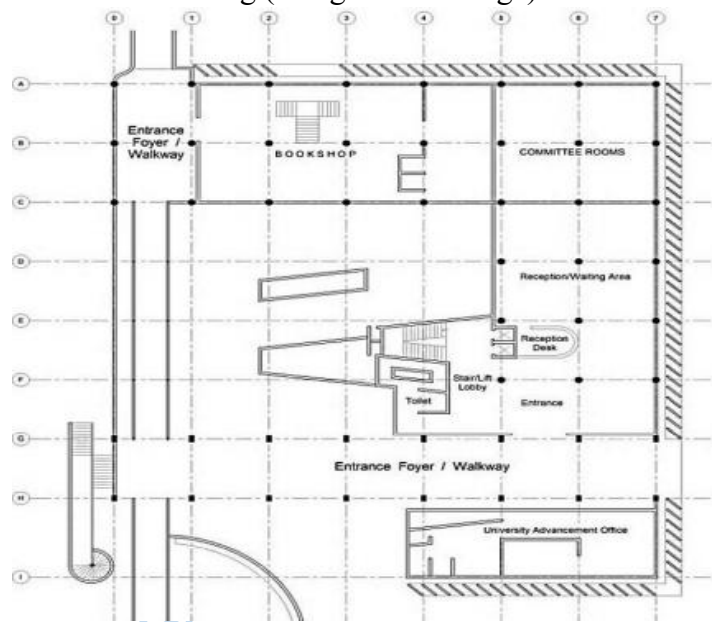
Ground floor plan of OAU Senate Building (Source Author's Field work)
